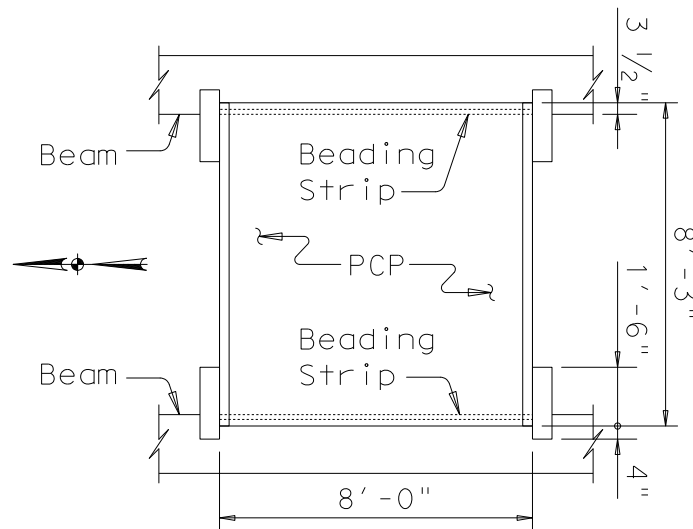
Plan View of Embedded Angle Connection PCP Specimen
